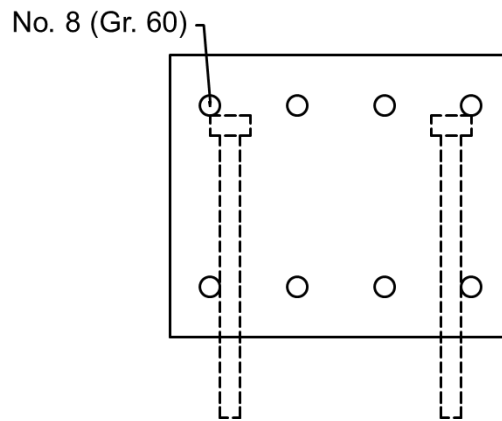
Layout B7: 8 No. 8 (Gr. 60)
